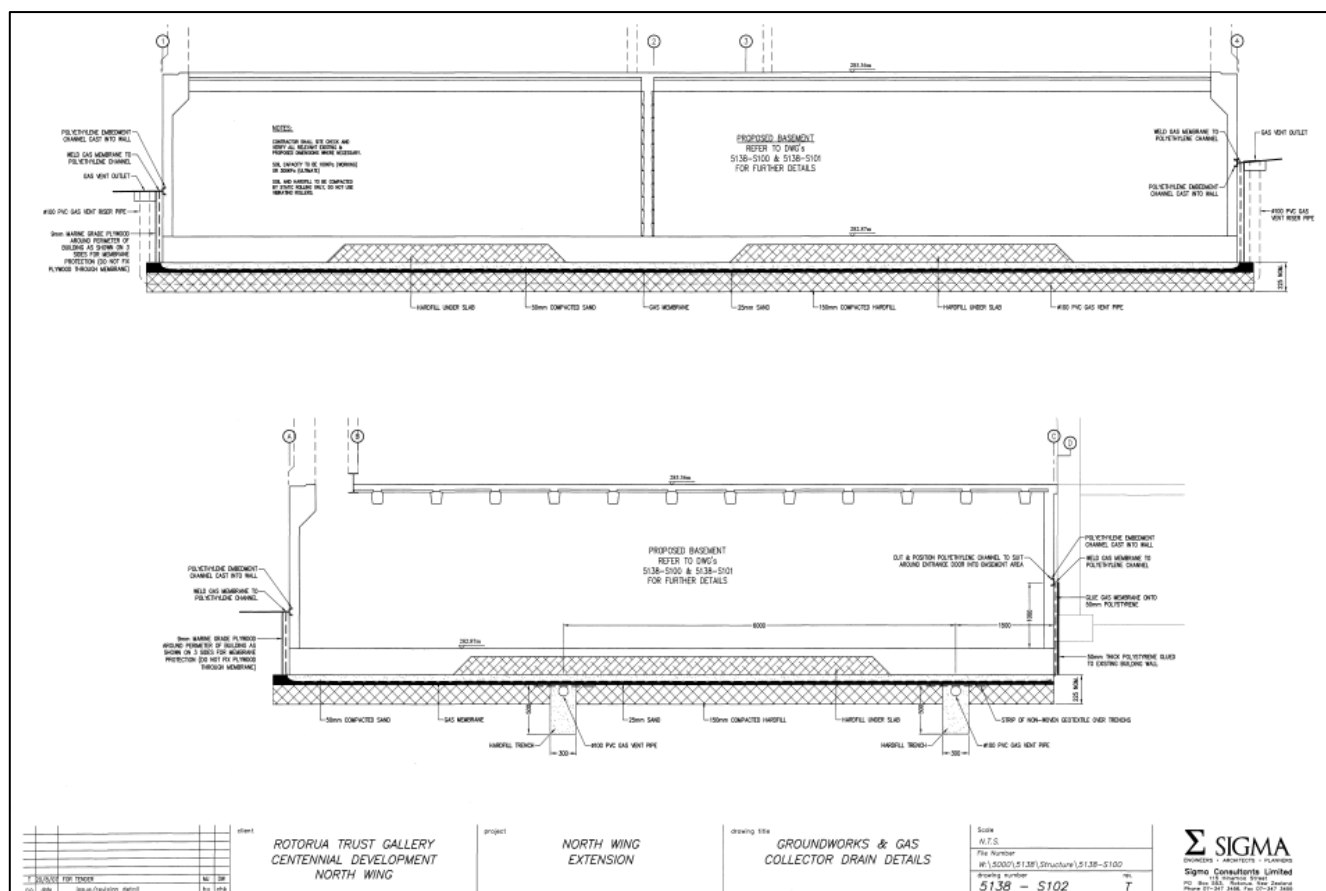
Sigma (2007), Groundworks & Gas collector drain details, Drawing no 5138-S102, Rev T
